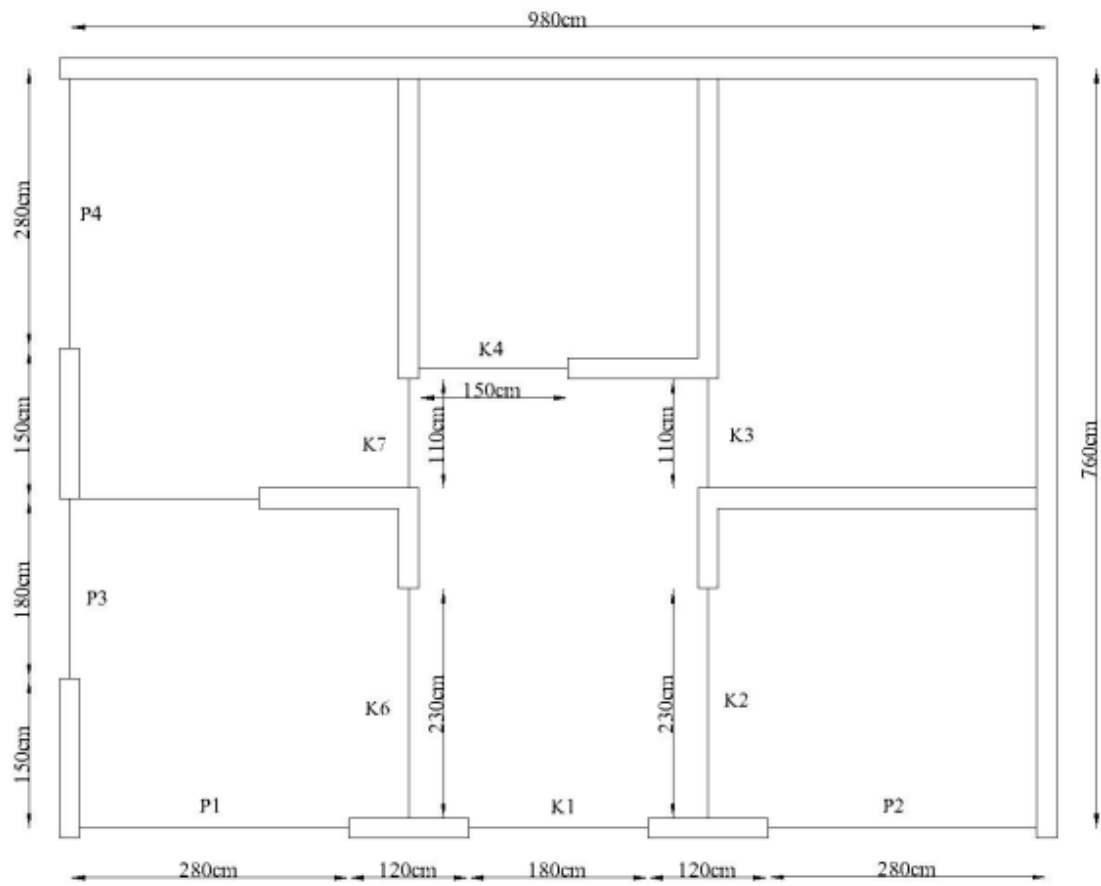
1. Plan geometry of subclass R2W2 of masonry building model
